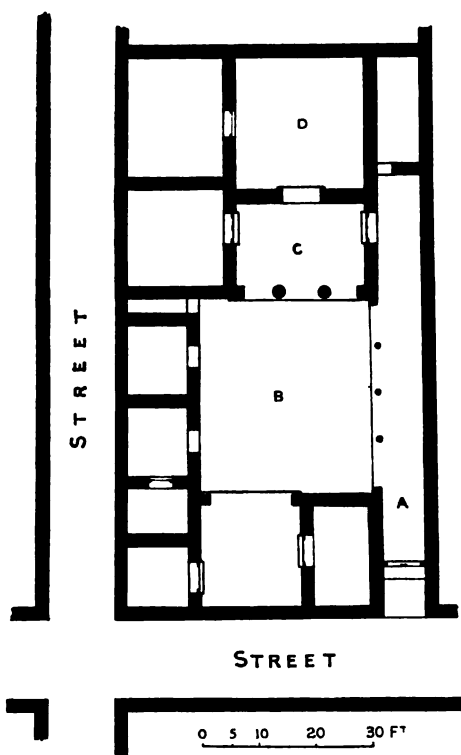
PLAN OF A GREEK HOUSE AT PRIENE, FACING SOUTH.
